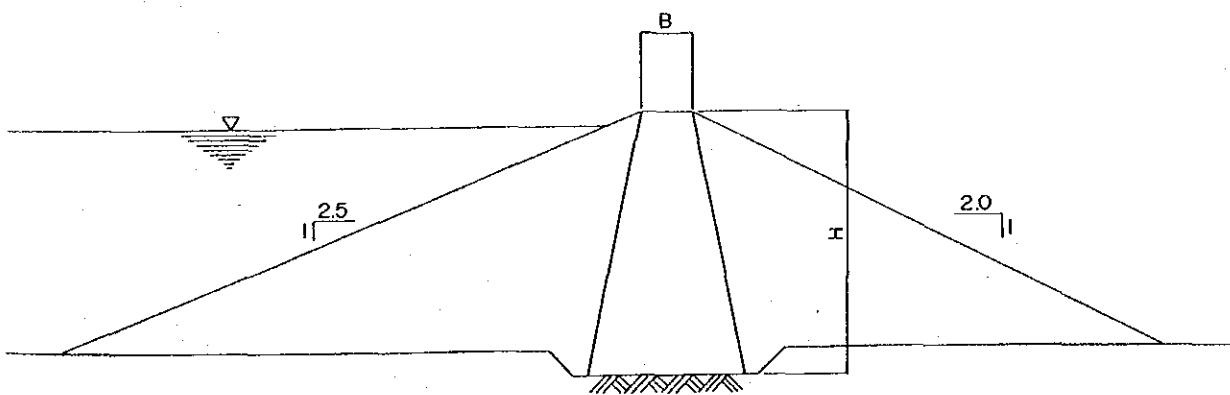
(I) PRELIMINARY LAYOUT OF DAM
